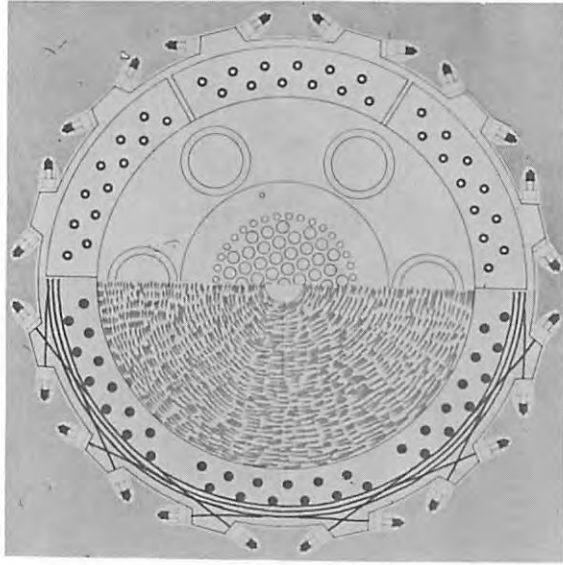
Horizontal Section of the 1 : 20 PCPV Model and plan view;
